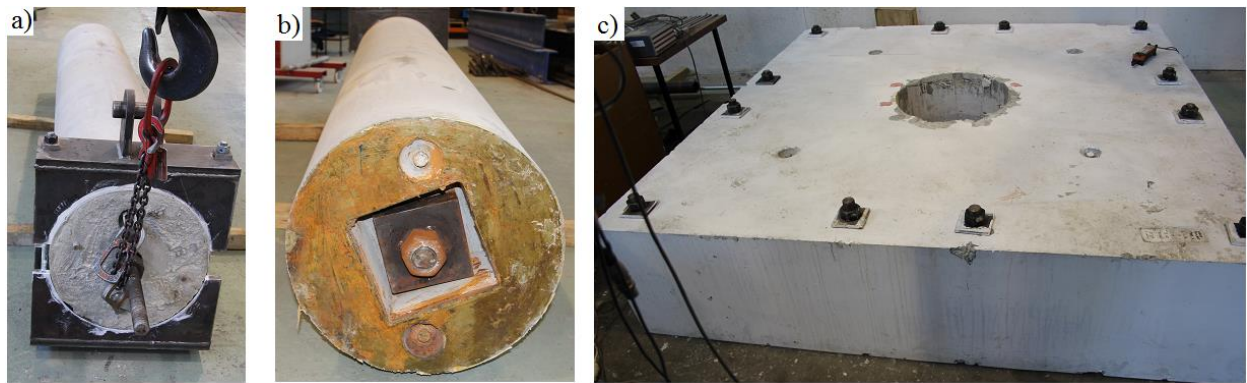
Prefabricated key components of ECIP, a) Post-tensioned pier with lateral load transfer element; b) details of post-tensioning anchorage at the bottom of the pier; c) foundation.
